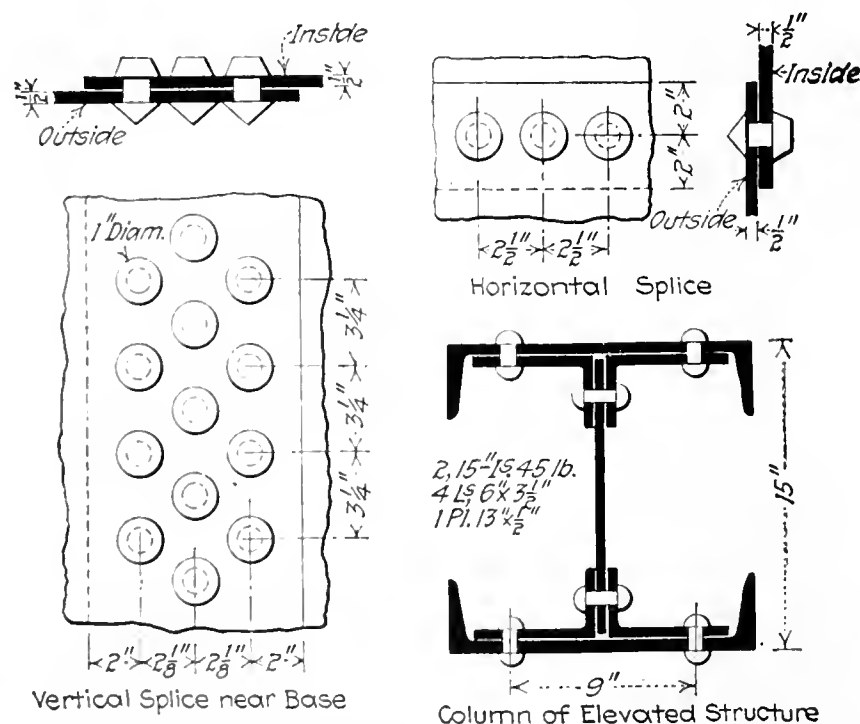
RIVETED JOINTS OF TANK AND SECTION OF ELEVATED COLUMNS
